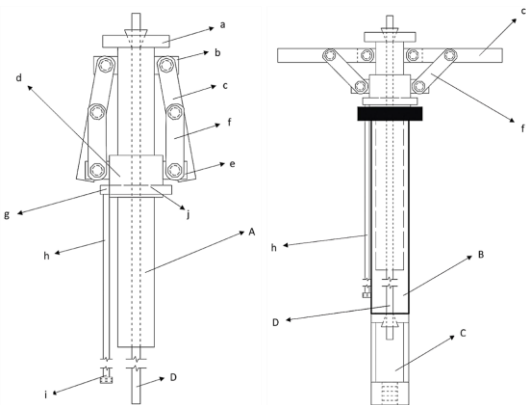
Umbrella anchor details in unlocked and locked positions, respectively; A. Anchor body, a. Anchor cap, b. Upper connection brackets, c. Cutter vanes, d. Open-close ring, e. Lower connection brackets, f. Support elements, g. Grouting ring, h. Grouting pipe, i. Grouting coupling, j. Nozzle orifices, B. Guide tube, C. Cable locking apparatus, D. Anchor cable (Evirgen et al. 2017)
